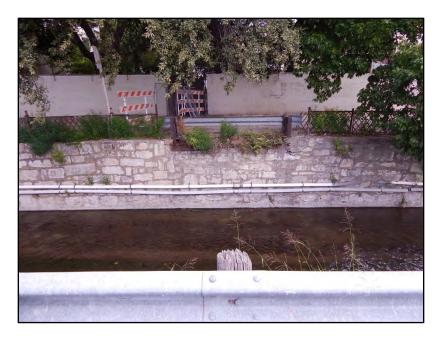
Location of former footbridge crossing San Pedro Creek.
